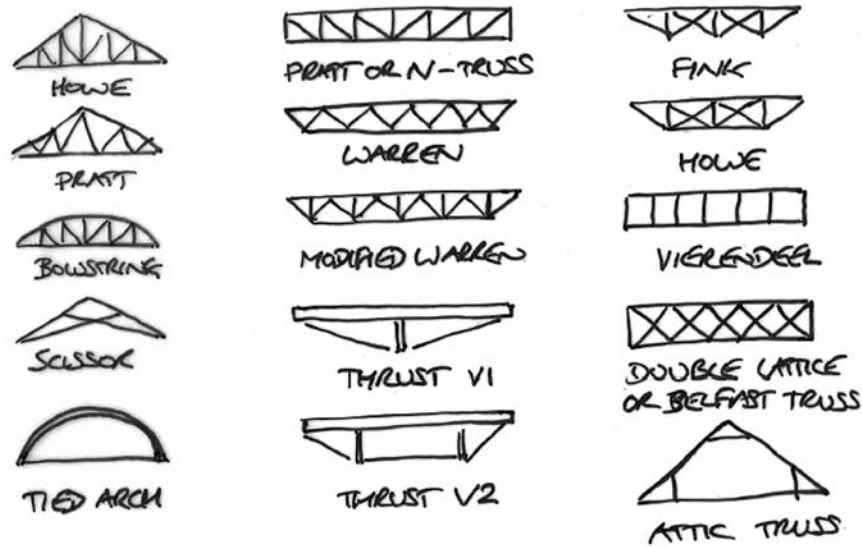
Sketch showing roof structure options to Bradford Academy
